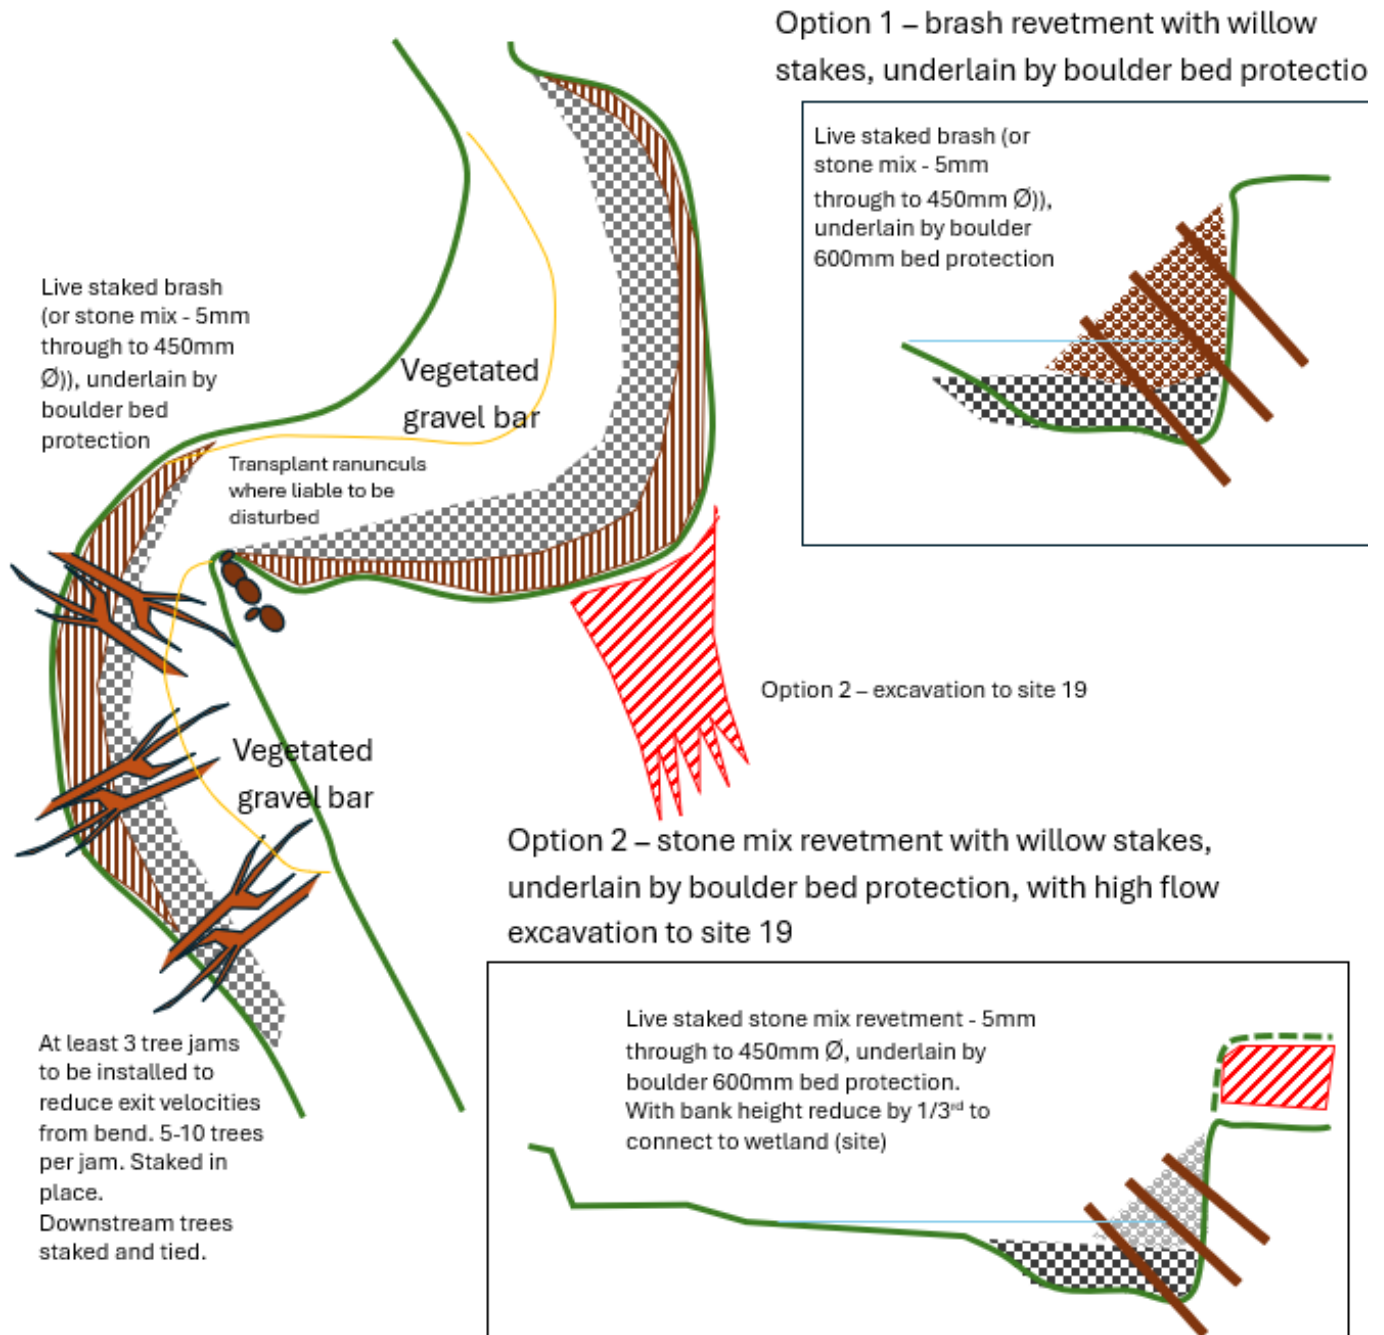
Detailed design drawing outlining the restoration works for Site 20.
